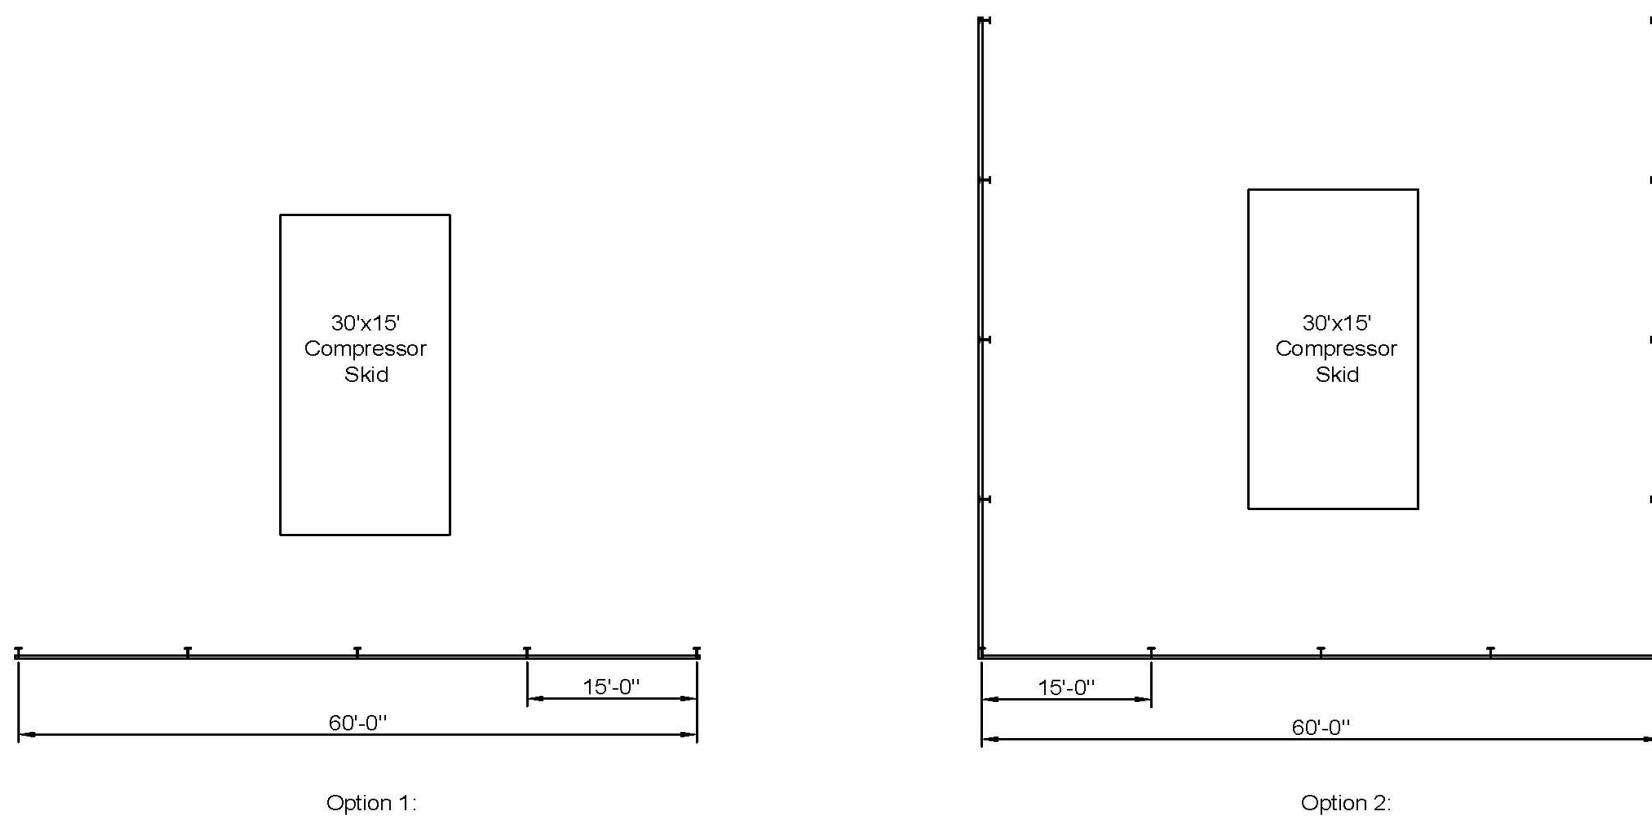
Layout of the Permanent Sound Wall Options – 16' Tall, 60 LF and 180 LF
